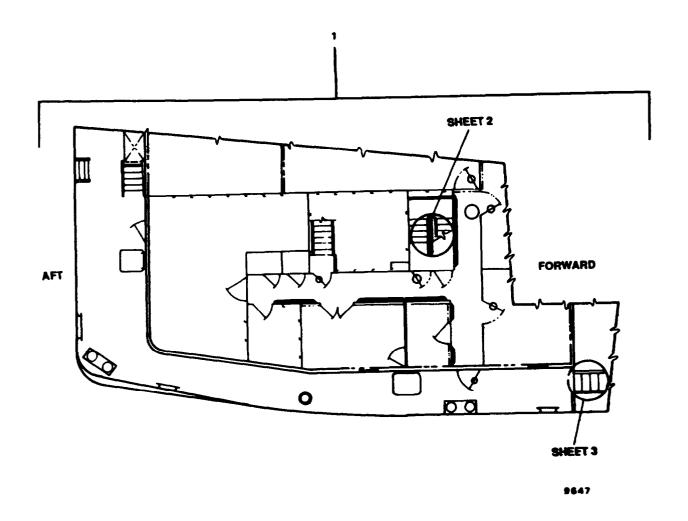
Main Deck Ladders and Handrails (Sheet 1 of 3).
